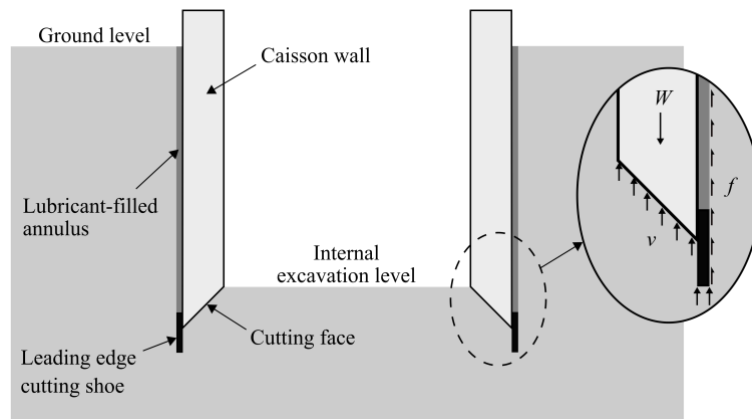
Schematic illustration of a section through an open caisson shaft, showing typical construction features and a detail of the forces on the caisson wall during sinking.
